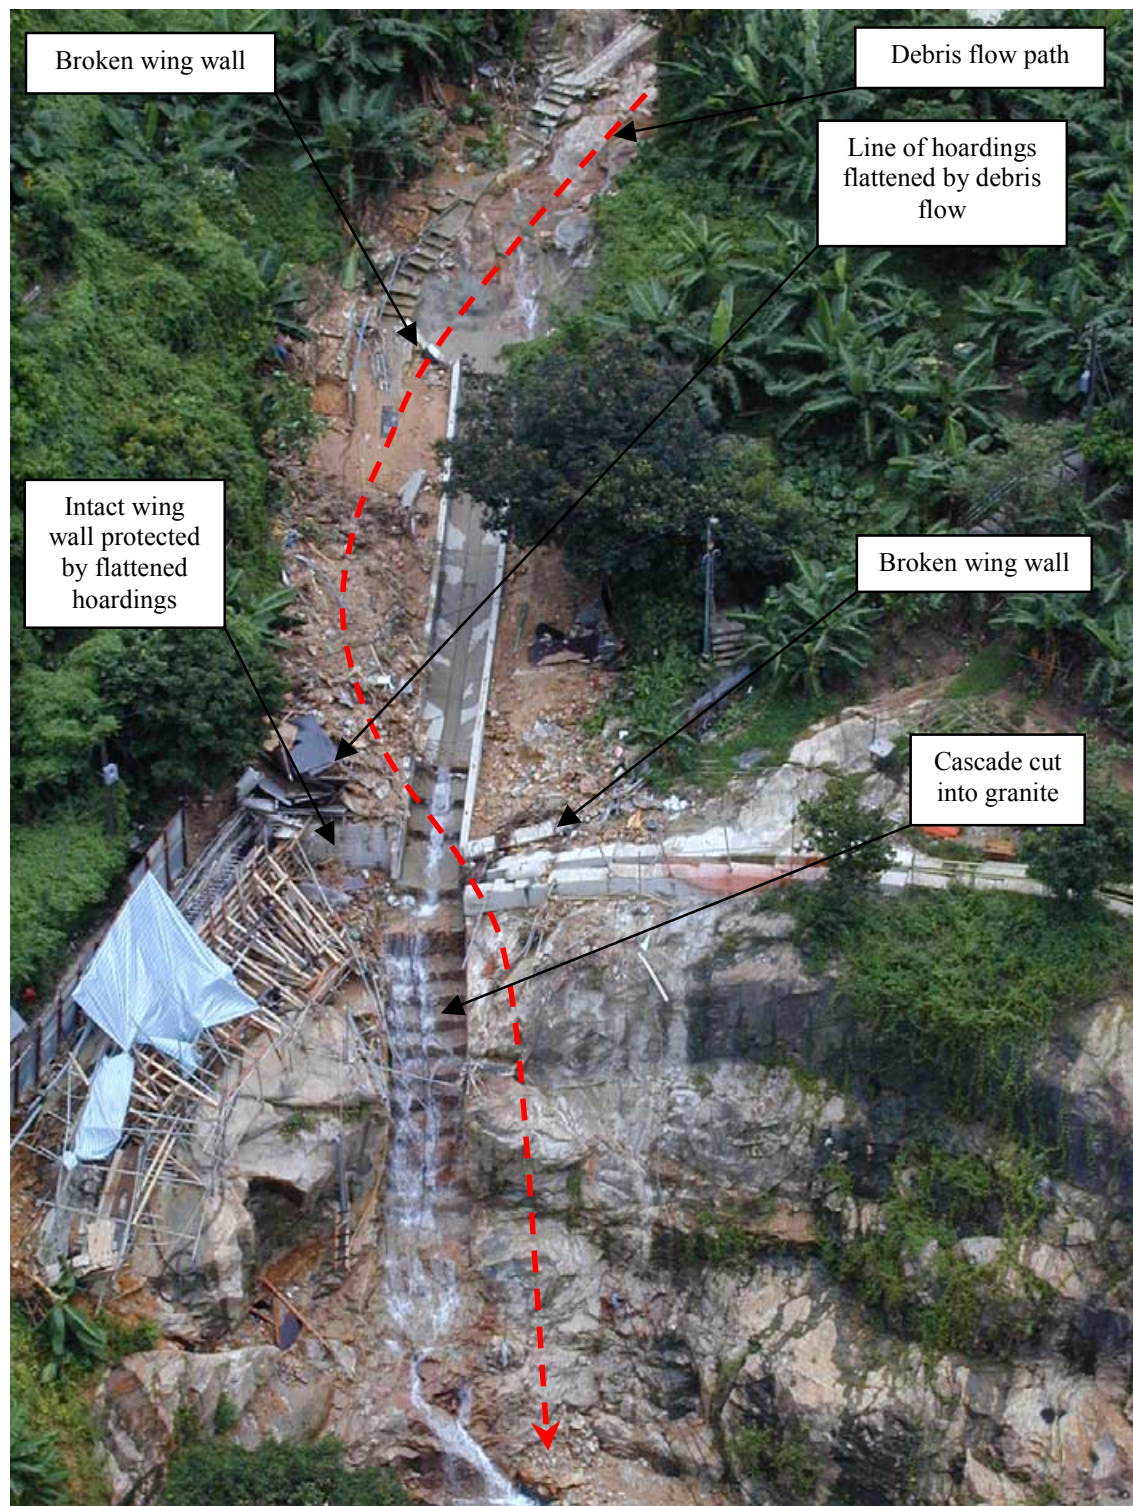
Oblique Aerial View of Trail from Upper Concrete Channel to Granite Cascade within Active Construction Site (Photograph taken on 5 September 2001)
